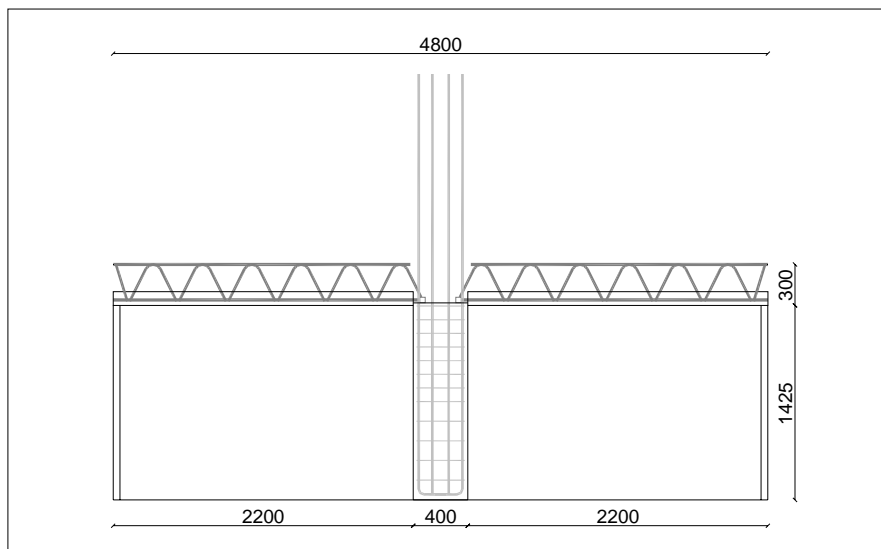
CSTC beam trusses positioning after the lower column concrete cast
